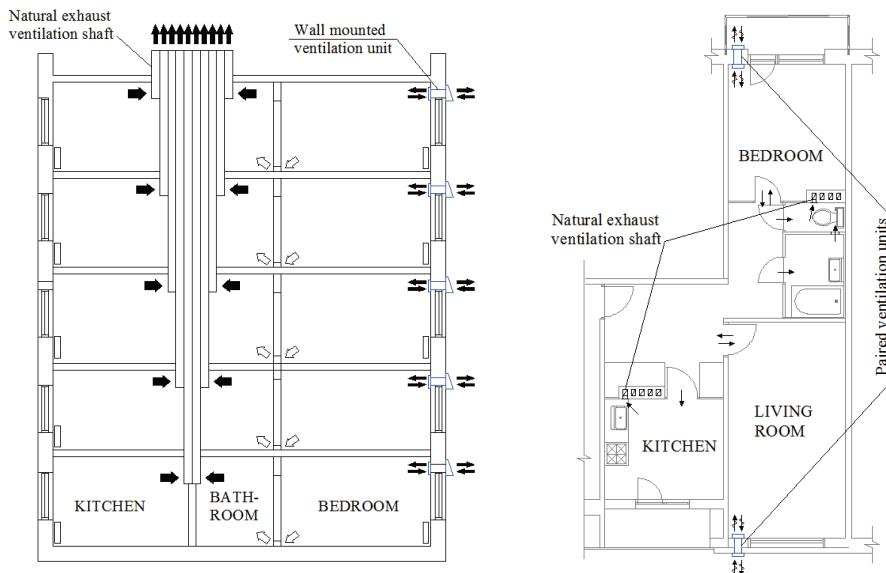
Principle solution of the ventilation system with room-based units: cross-section (left) and floor plan of a typical apartment (right).
